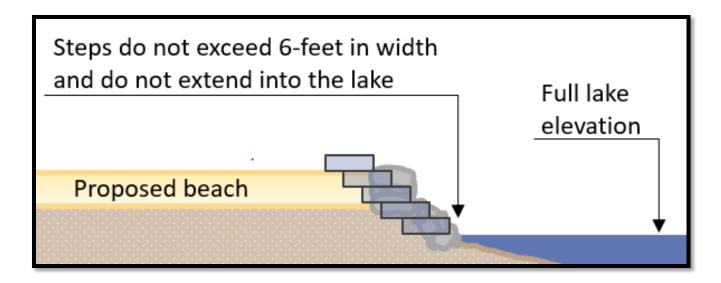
Access steps for beaches with hardened shorelines must be cut into the bank, not extended into the lake.
